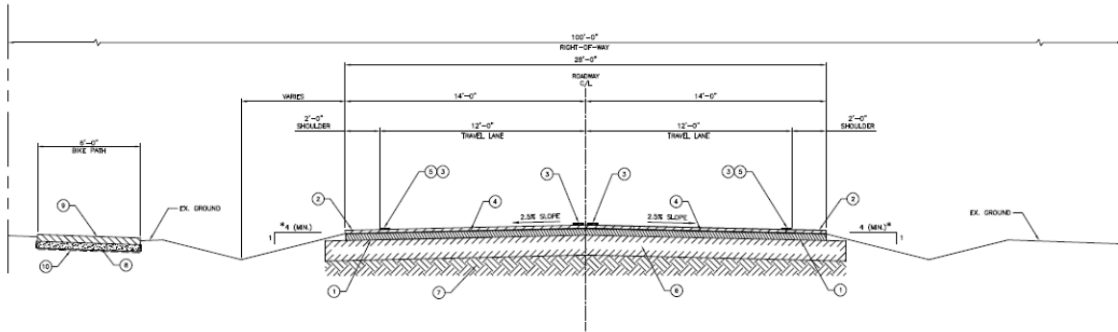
Typical 2-lane Harrison Ave Extension Roadway Section
